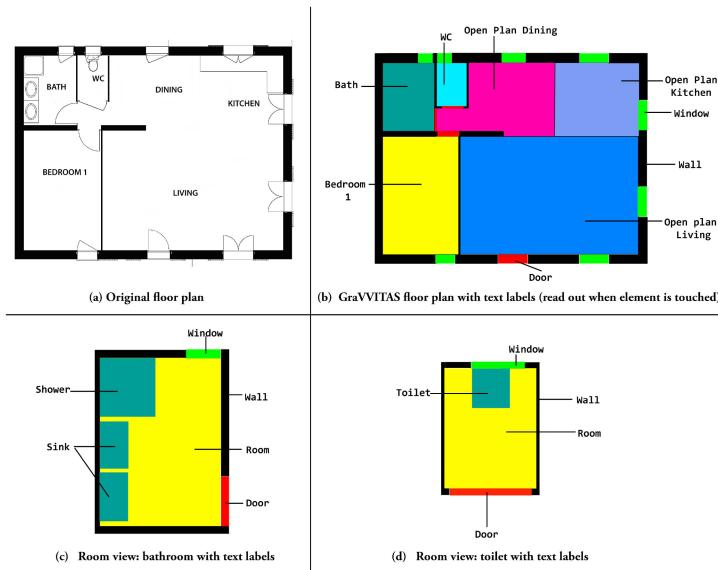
GraVVITAS presentation of a second simple floor plan.
